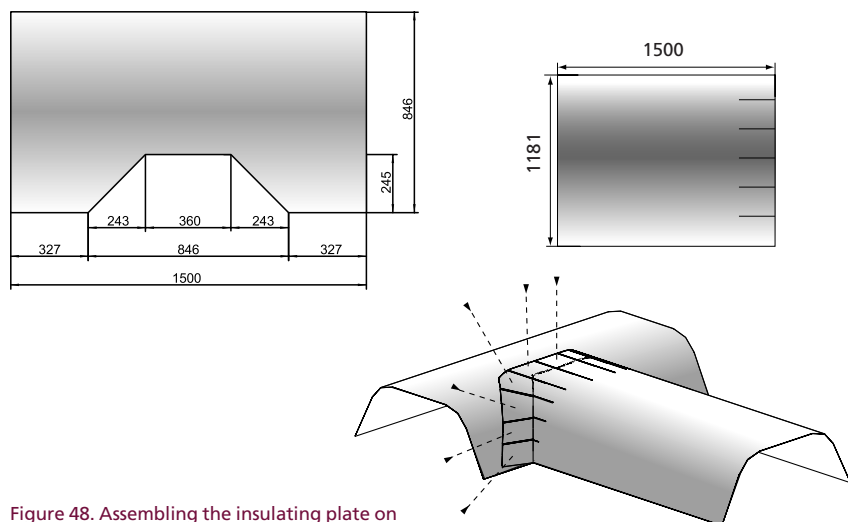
Assembling the insulating plate on the "T" connections in the strip
